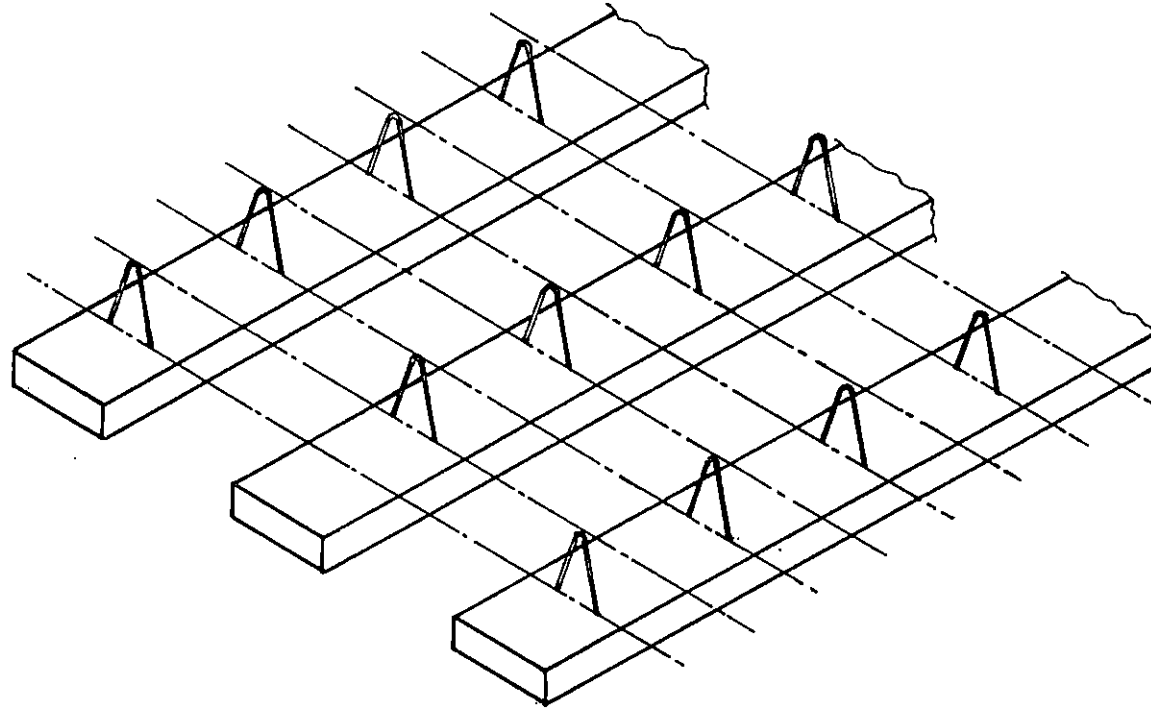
Staggered arrangement of wire loops on wooden slats.
